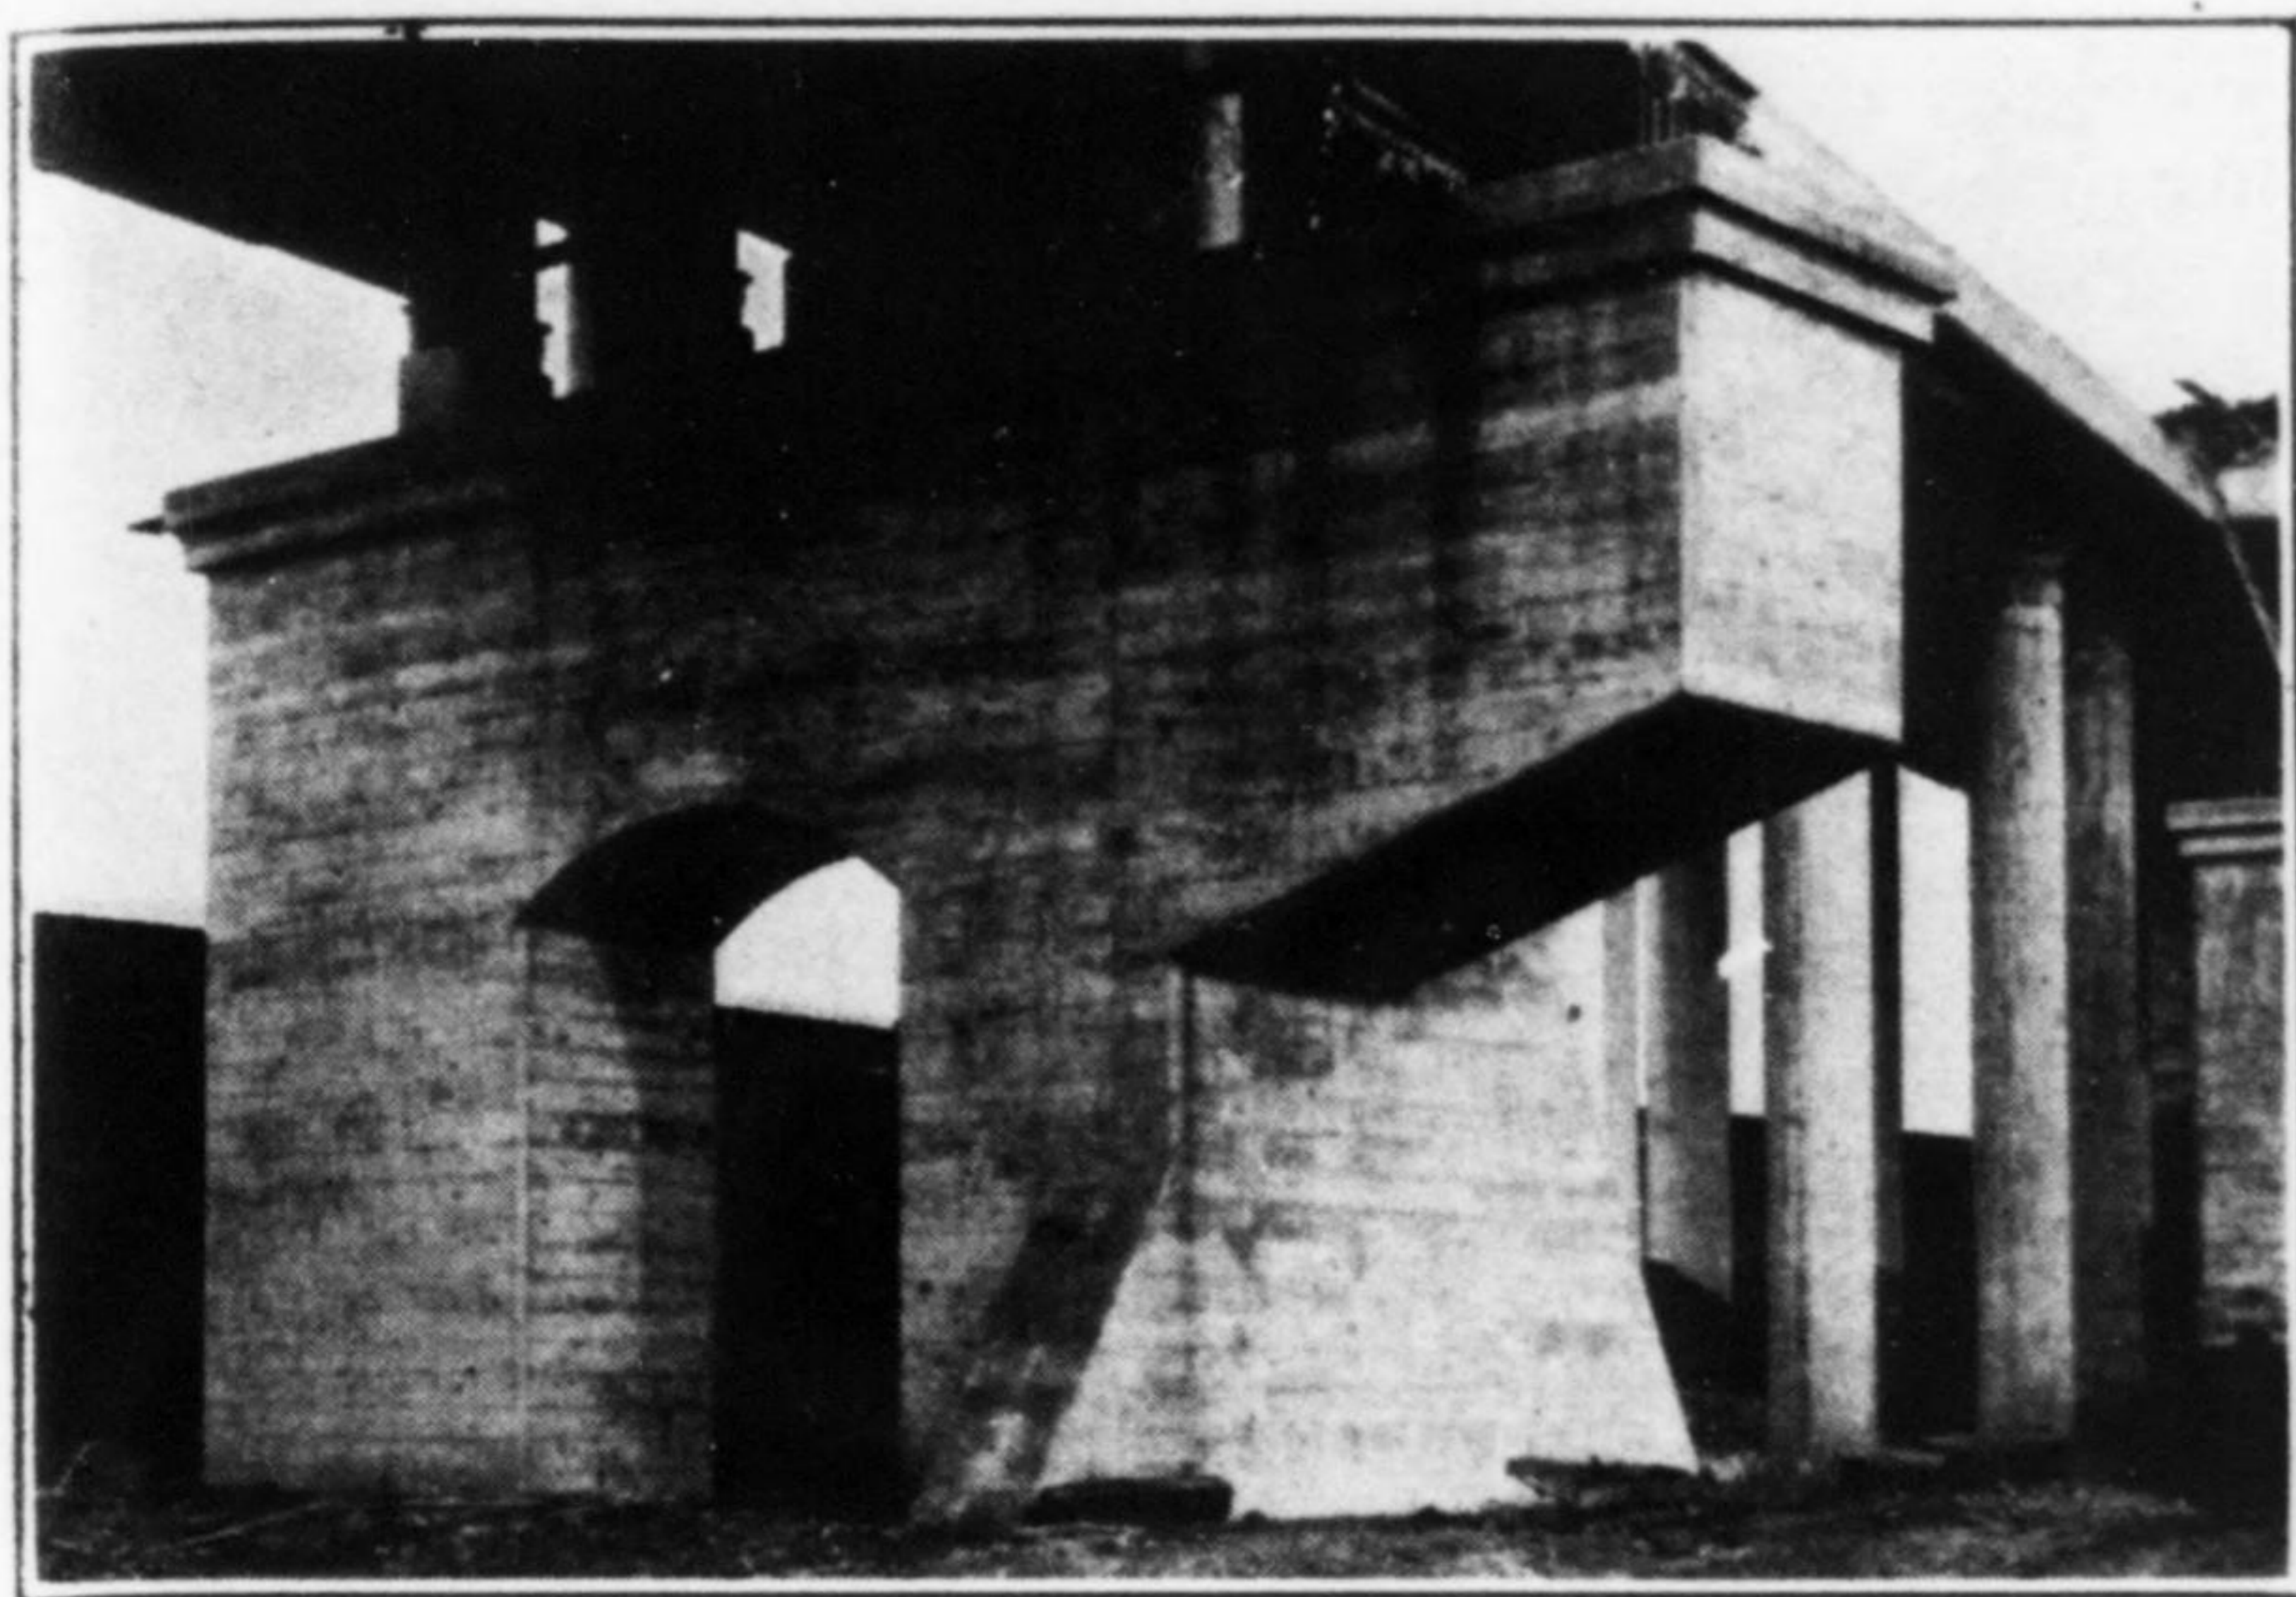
CANTILEVER PIER AT DUFFIELD AVE.
